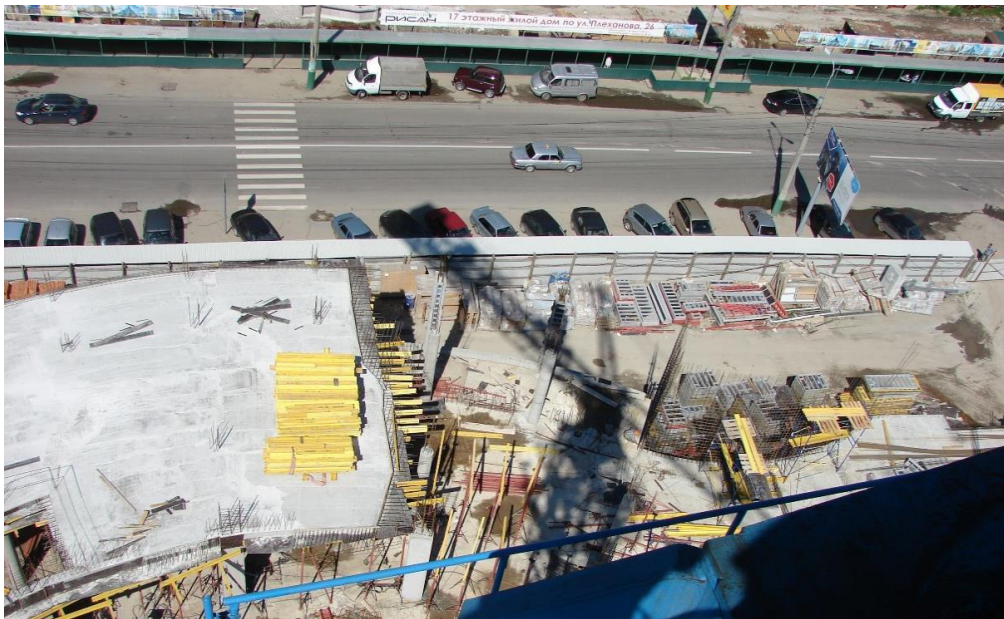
The open space for assembling the big top roof trusses (shuttering constructions and other materials storage can be seen in the erection crane shadow).
